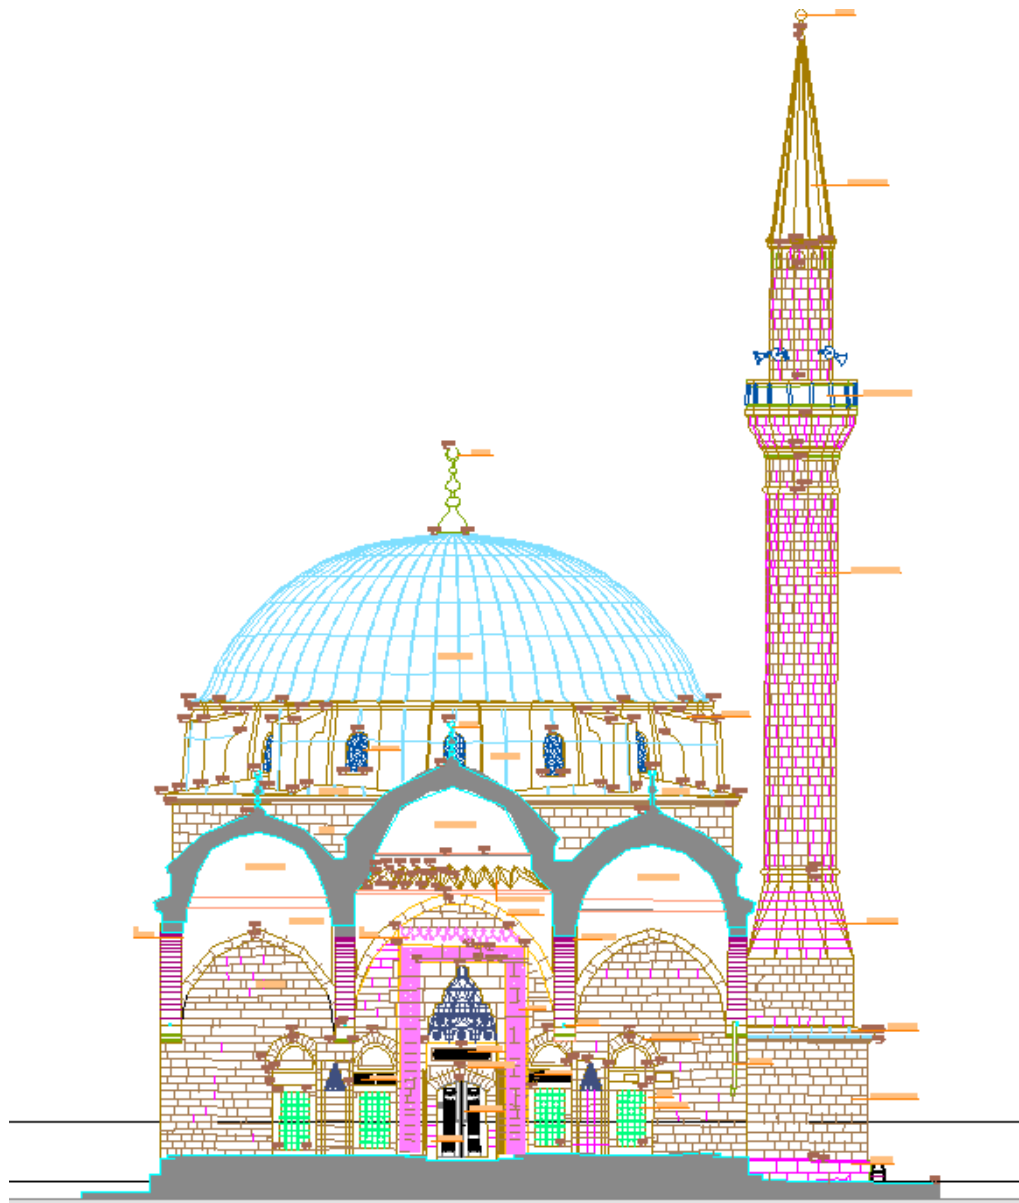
Section of the front façade of the Mosque (drawings by SAYKA Construction Architecture Company, 2008)
